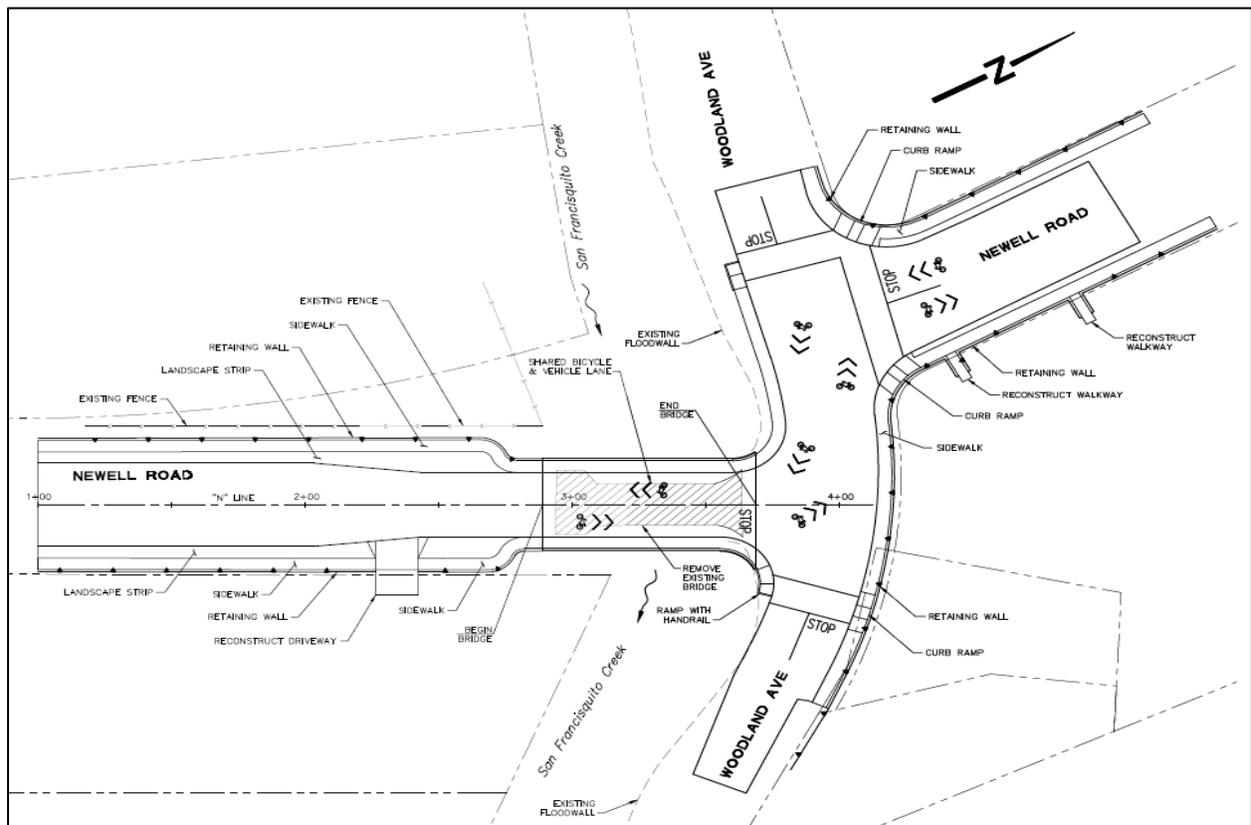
New Two-Lane Vehicle Bridge Option on Existing Alignment of Newell Road
